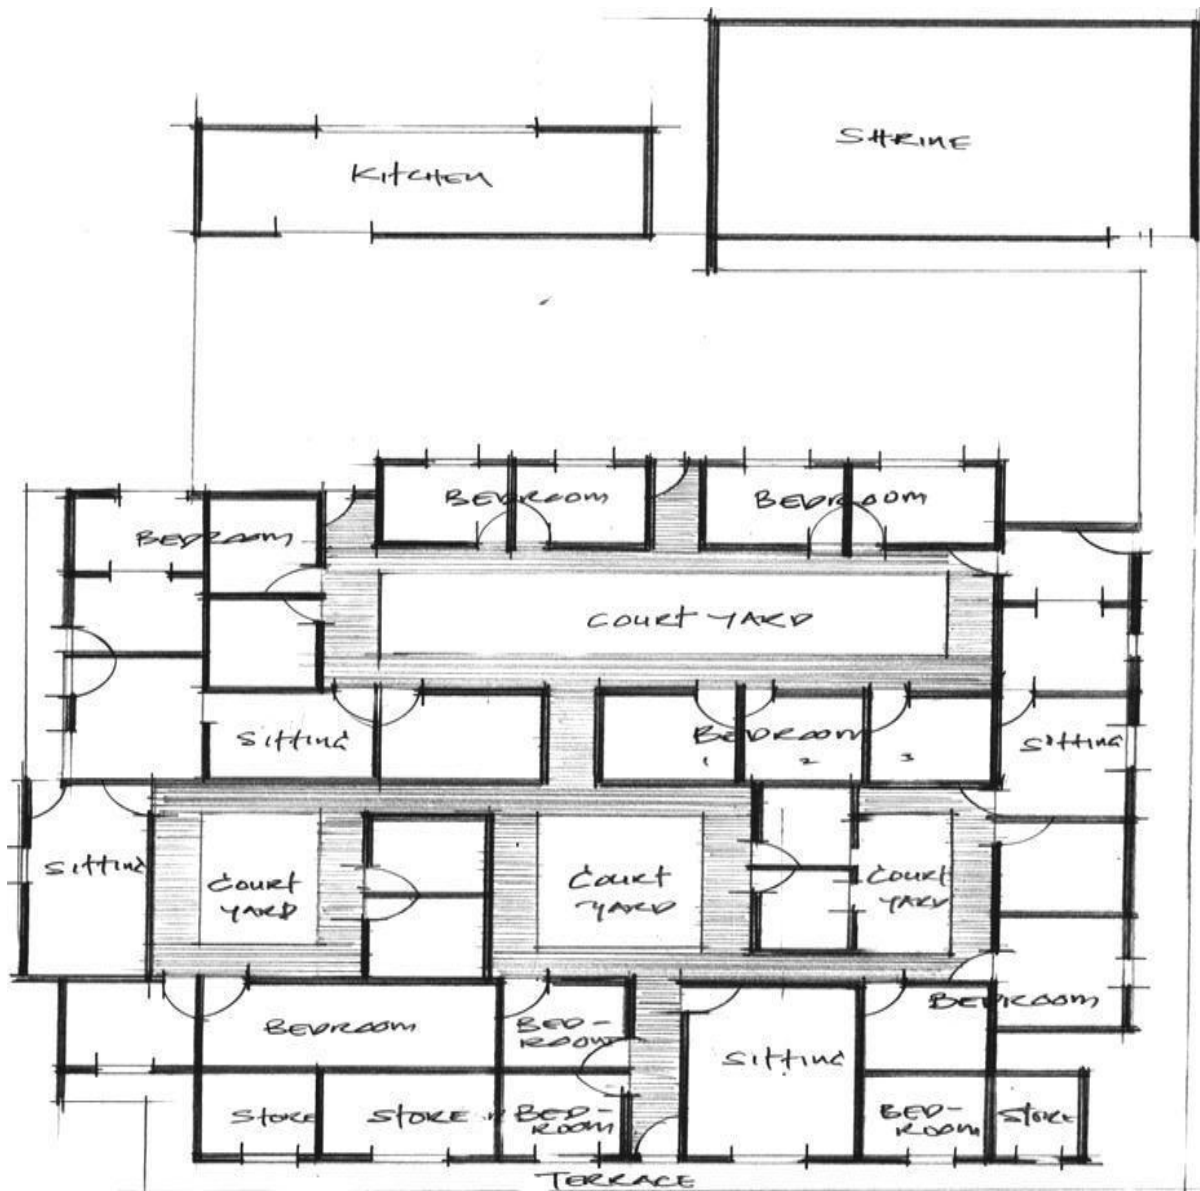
Floor Plan of a Typical Palace Compound Benin House
